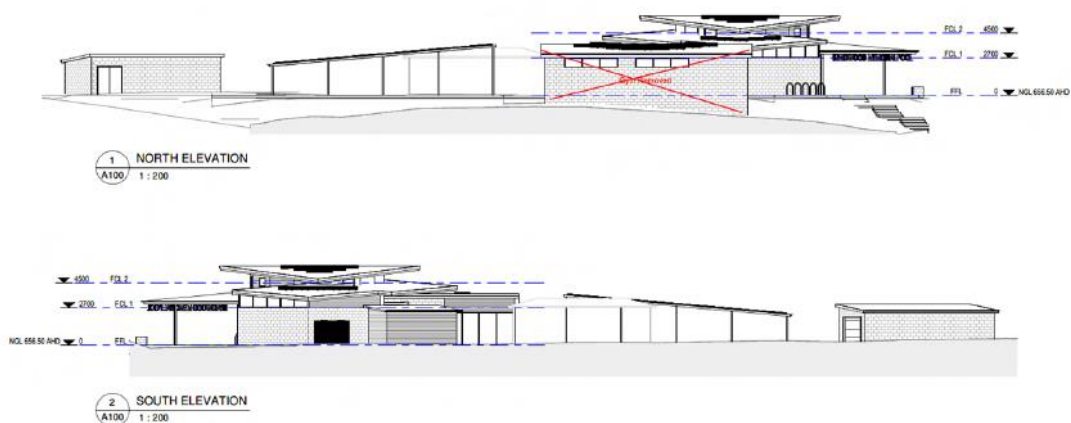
Previously Approved (under DA.2021.1258) North and South External Elevations (Prepared by Paul Barnett Design Group)
